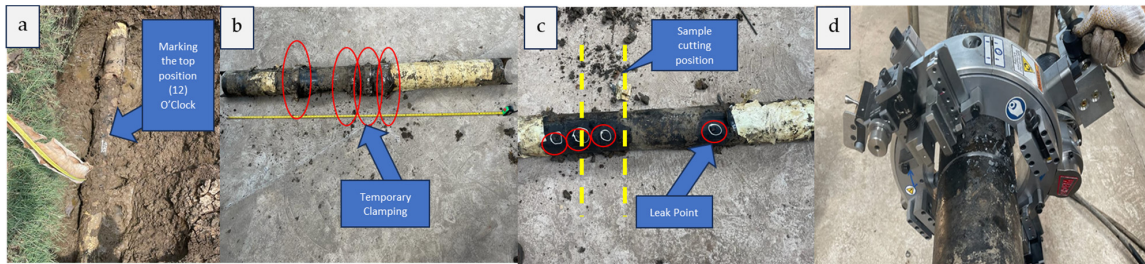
Pipe sampling. (a) Marking on pipe samples before cutting; (b) Temporary clamping; (c) Sample cutting position; (d) Sample cutting.
